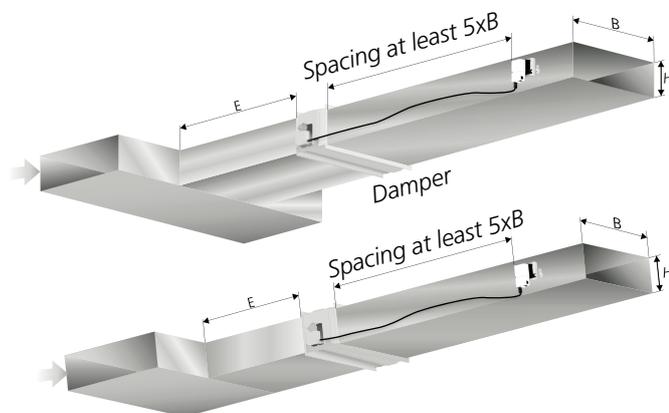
Straight duct section and distance requirements in rectangular ducts.
